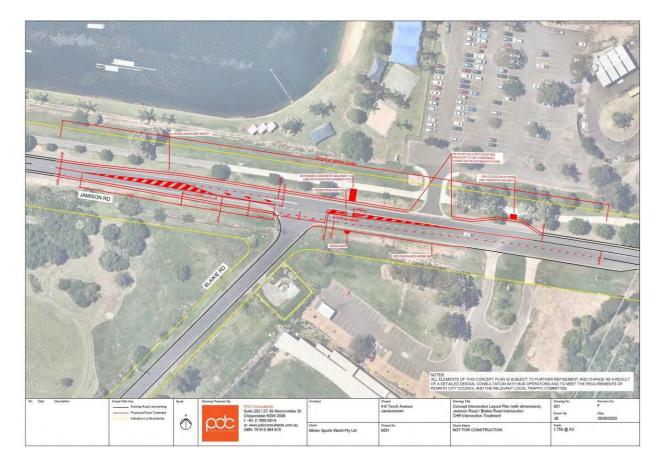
Upgraded layout of the Jamison Road and Blaike Road intersection with the CHR treatment
